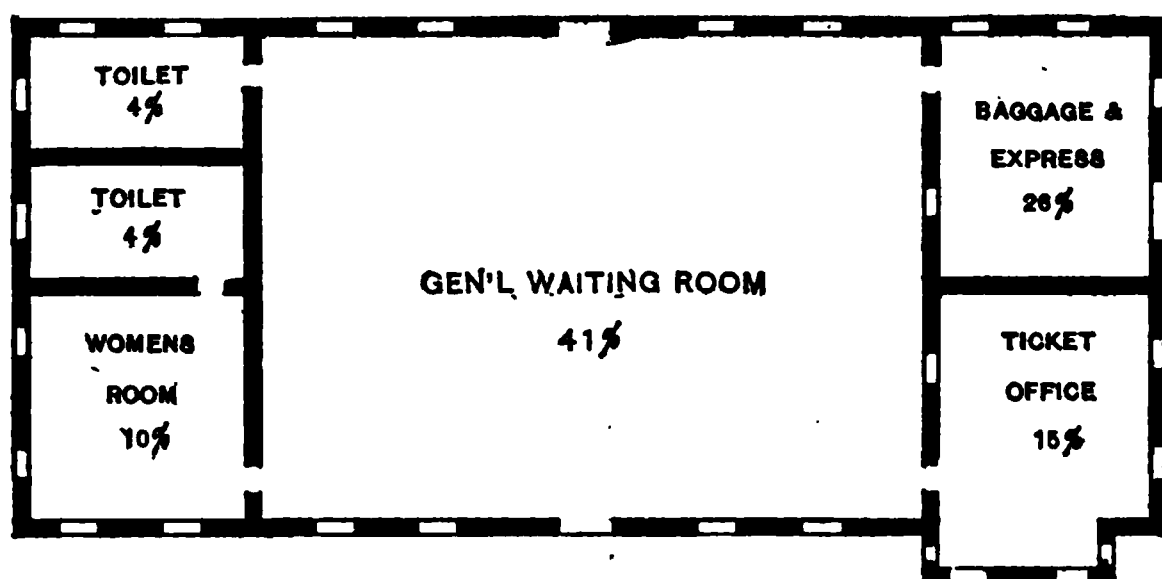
DIVISION OF FLOOR AREA RECOMMENDED FOR PASSENGER STATIONS WITH ONE GENERAL WAITING ROOM.
